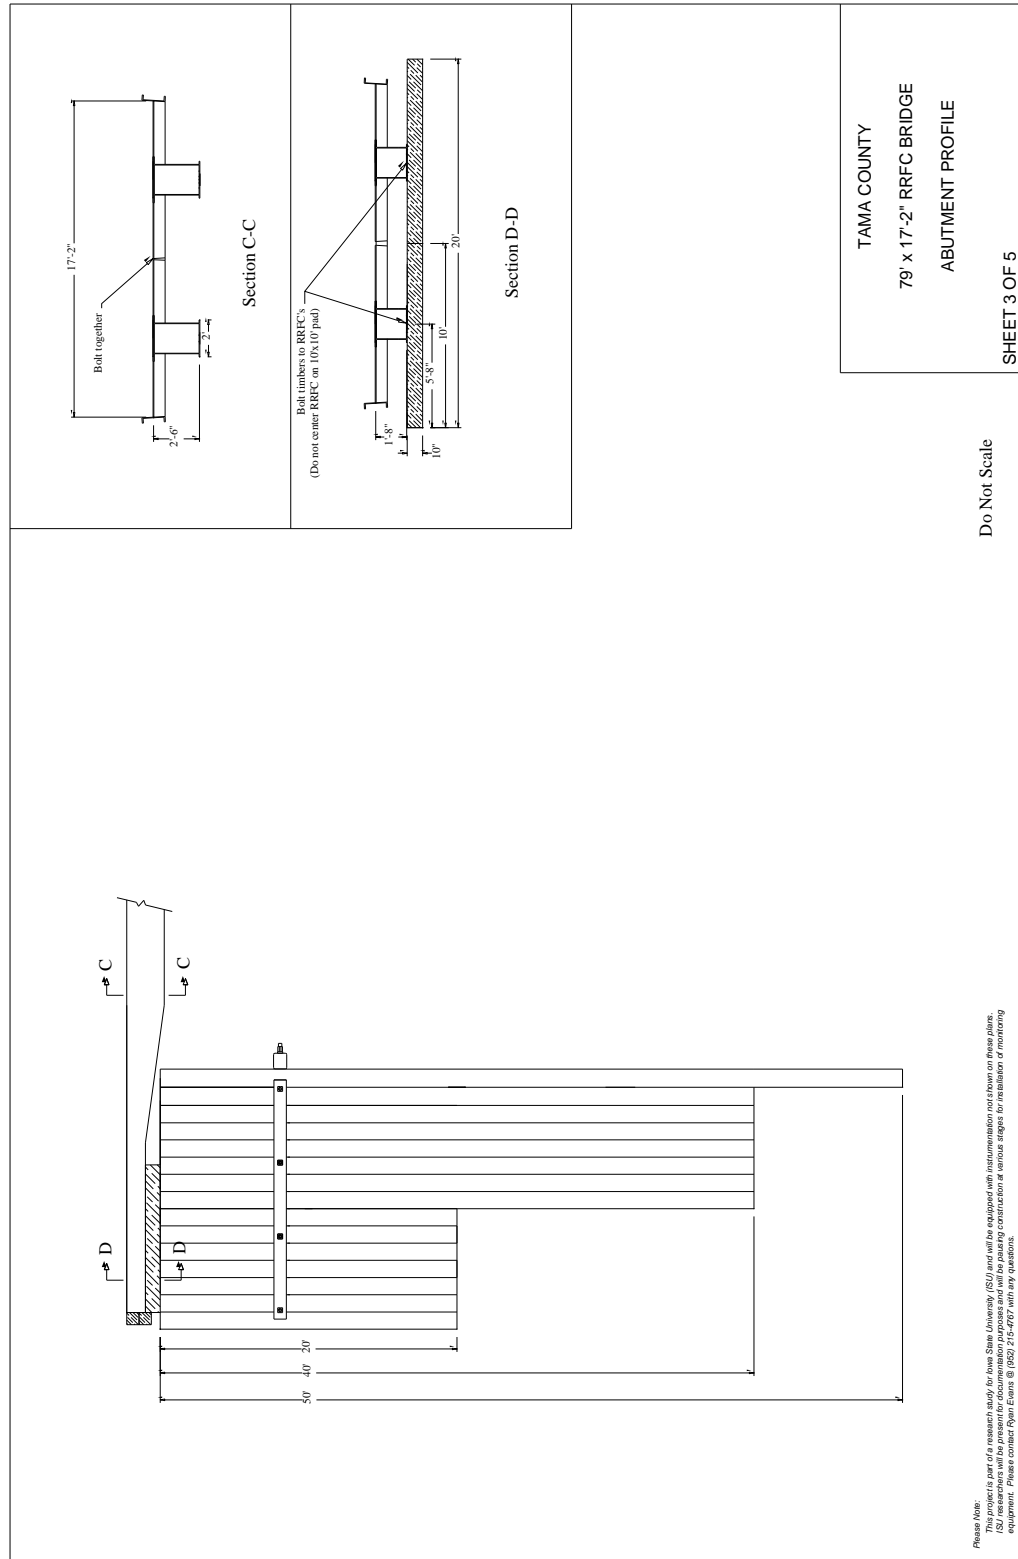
Abutment profile (alternative system) for demonstration project in TC, Iowa
